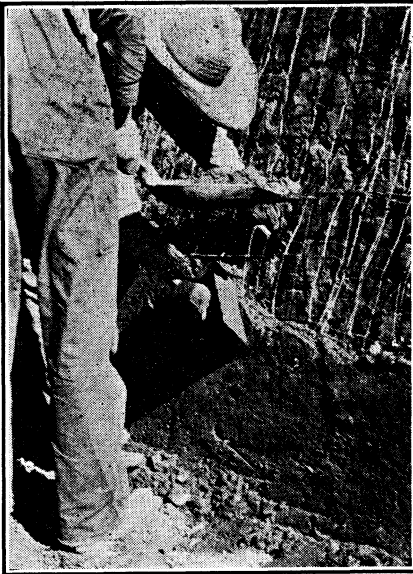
This close-up view shows how the concrete is put in place with a shovel and trowel, with hogwire used as reinforcing.
